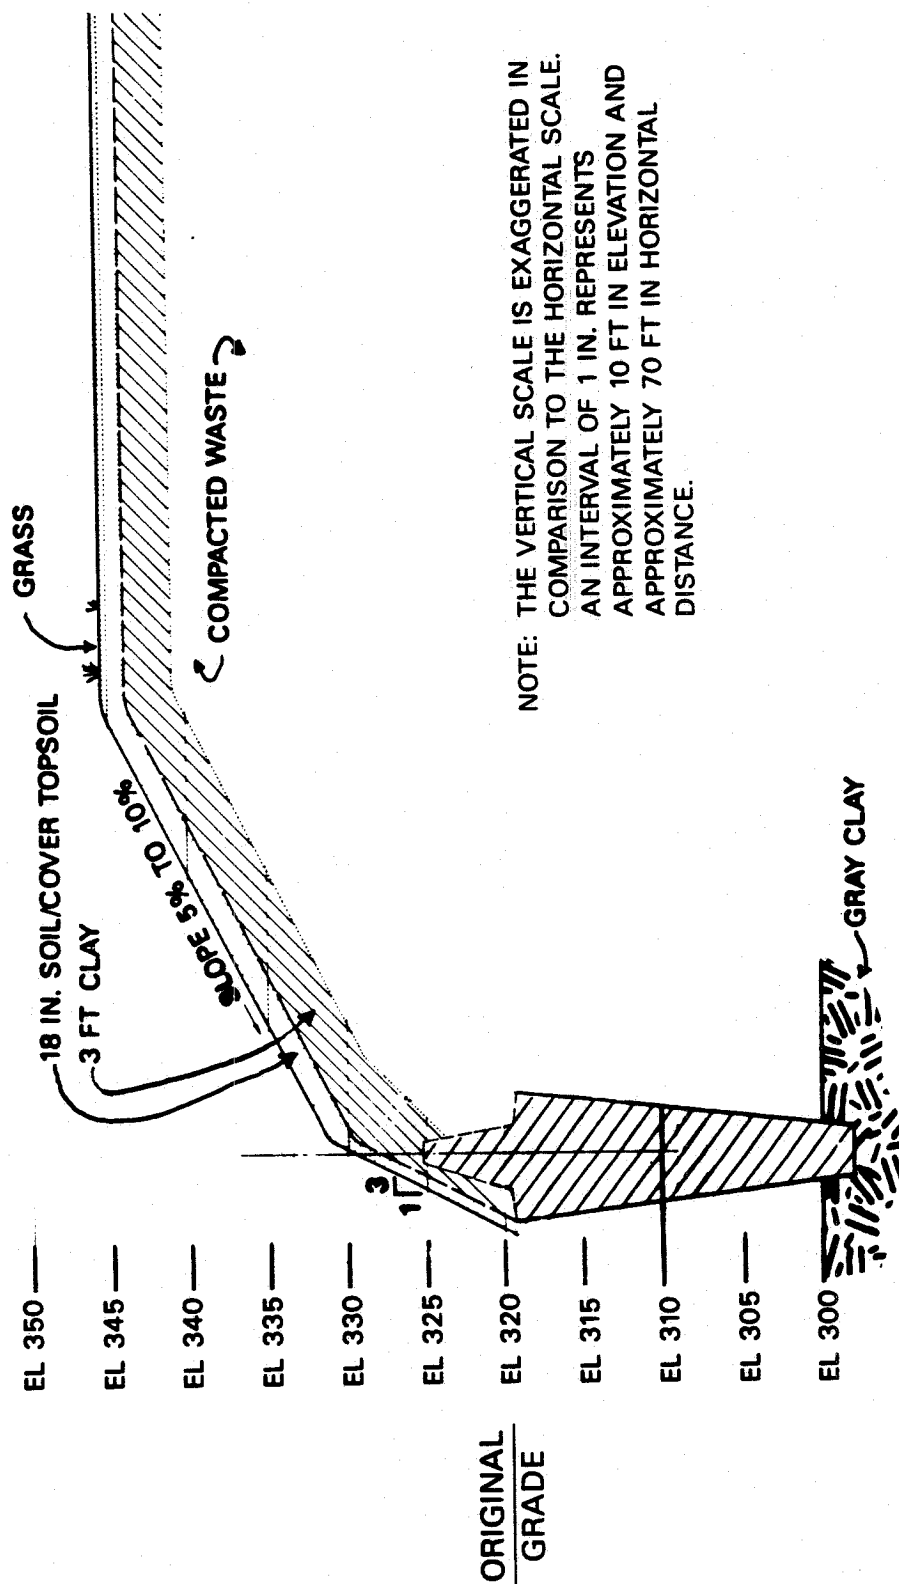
CROSS SECTION OF THE NFSS WASTE CONTAINMENT STRUCTURE
